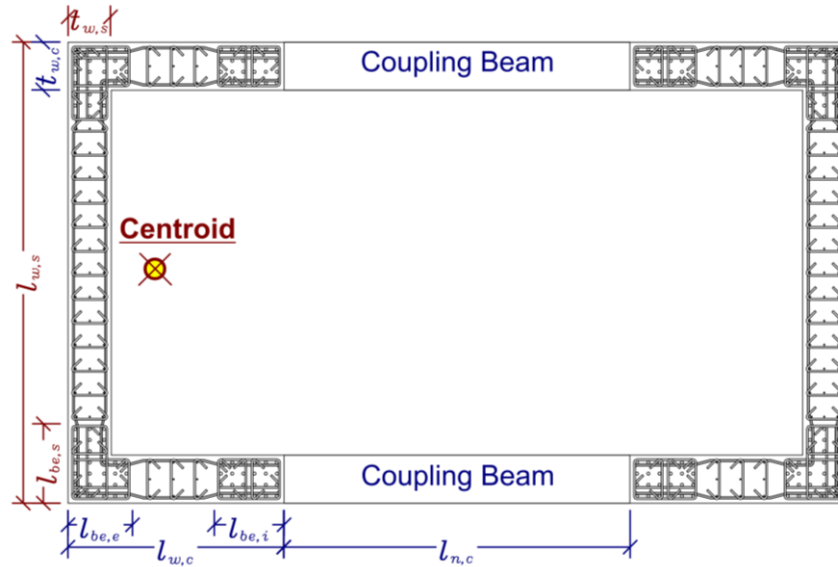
C-shaped wall centroid to calculate the wall piers demand.
